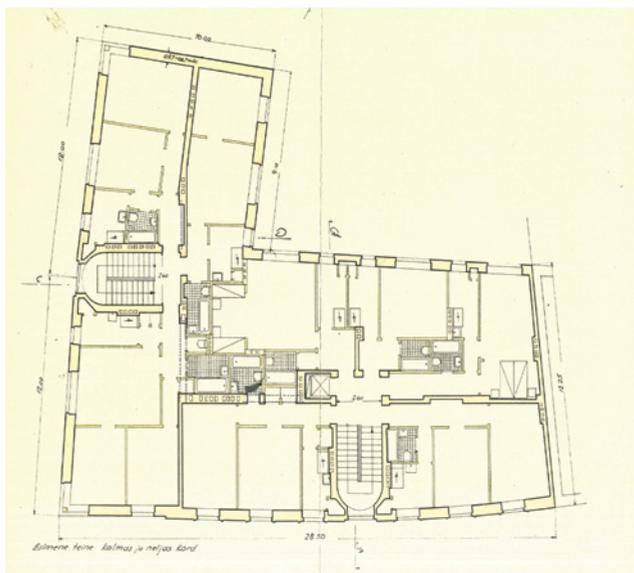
The plan of the third floor of the apartment building at 4 Aedvilja Street in Tallinn city centre (1937).
